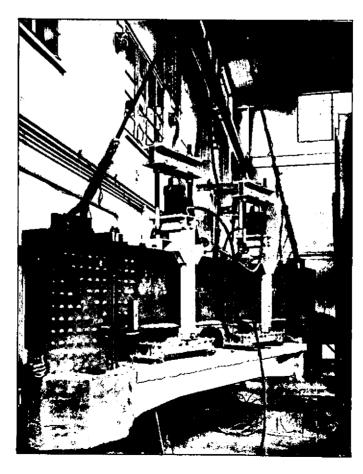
AN A/1/2 BEAM IN LOADING BRIDGE READY FOR TEST
